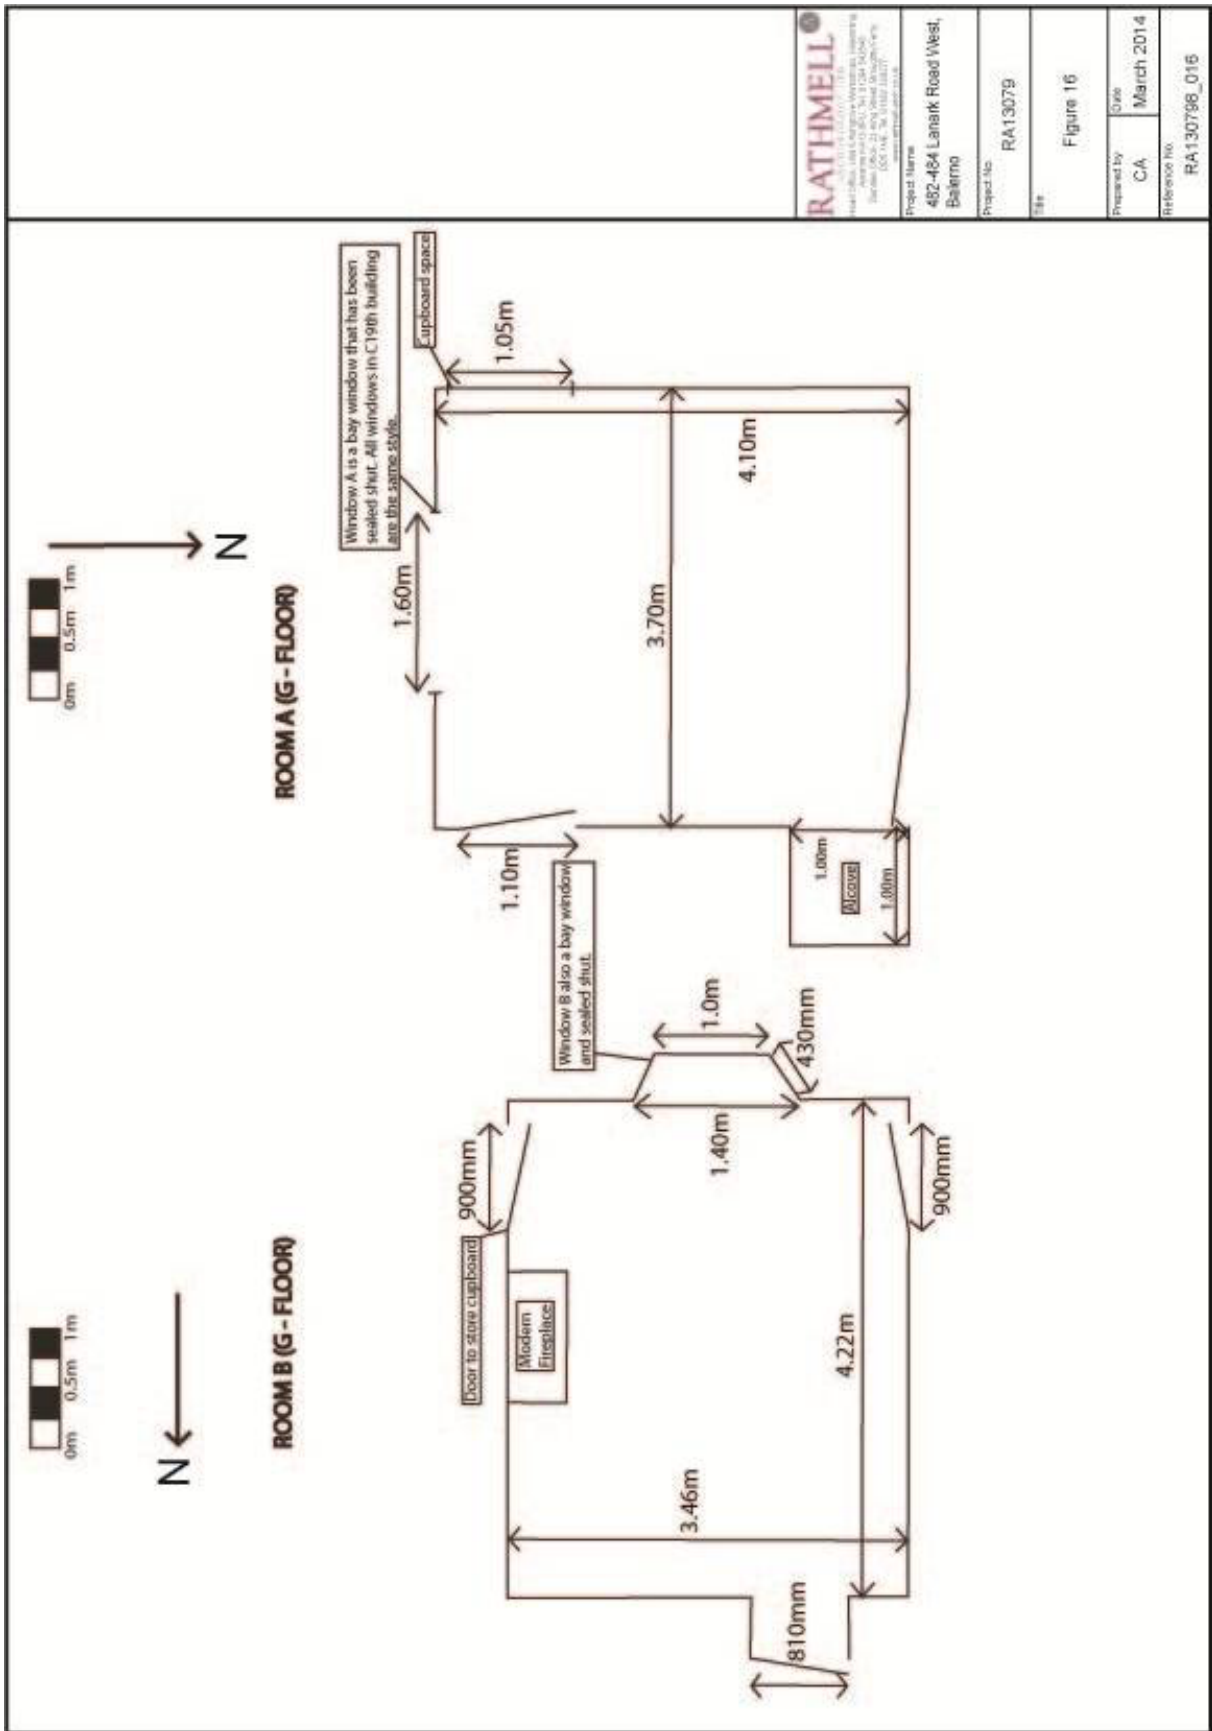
Building A - Plan of Rooms A and B on the ground floor.
